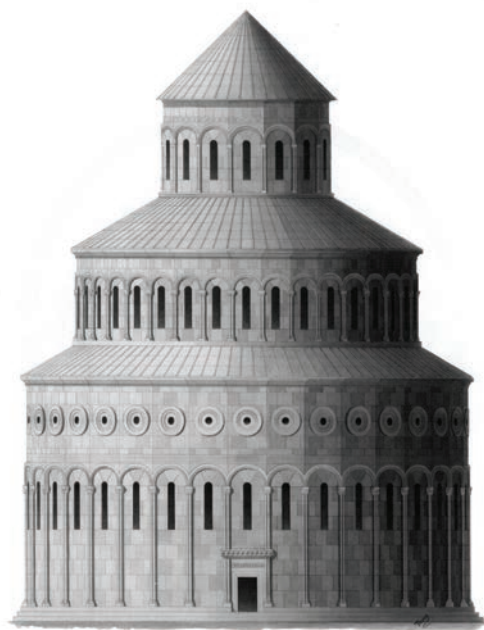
Ani, Gagkashen Church, façade, reconstruction by Toramanian T., ca. 1913 (Strzygowski, 1918)
